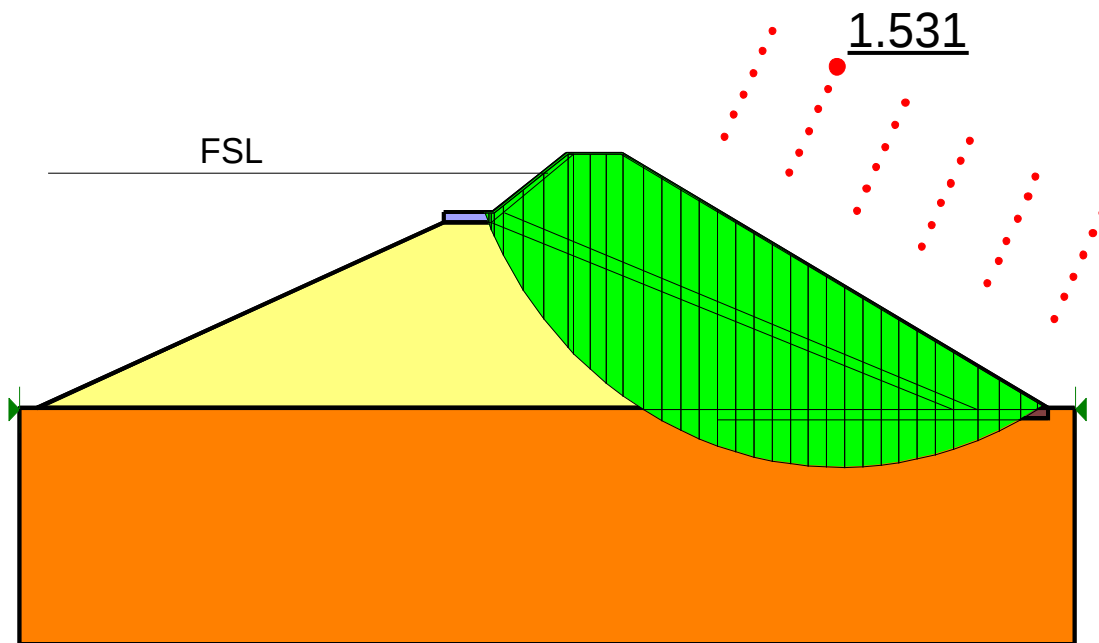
Slope Stability Analysis of asphalt concrete face heightening under Steady State (downstream Face)
